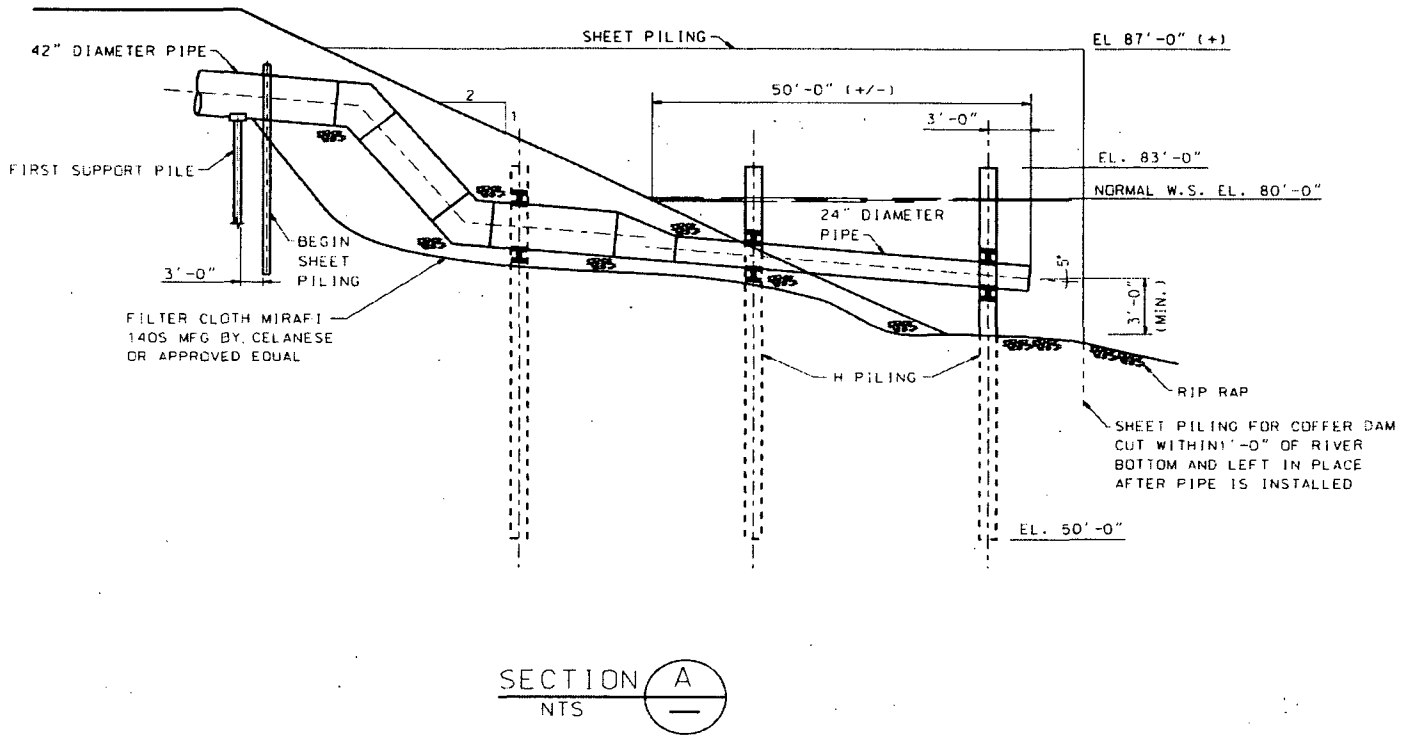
Section View of New Discharge Outfall for the Discharge System (Southern 2008).
